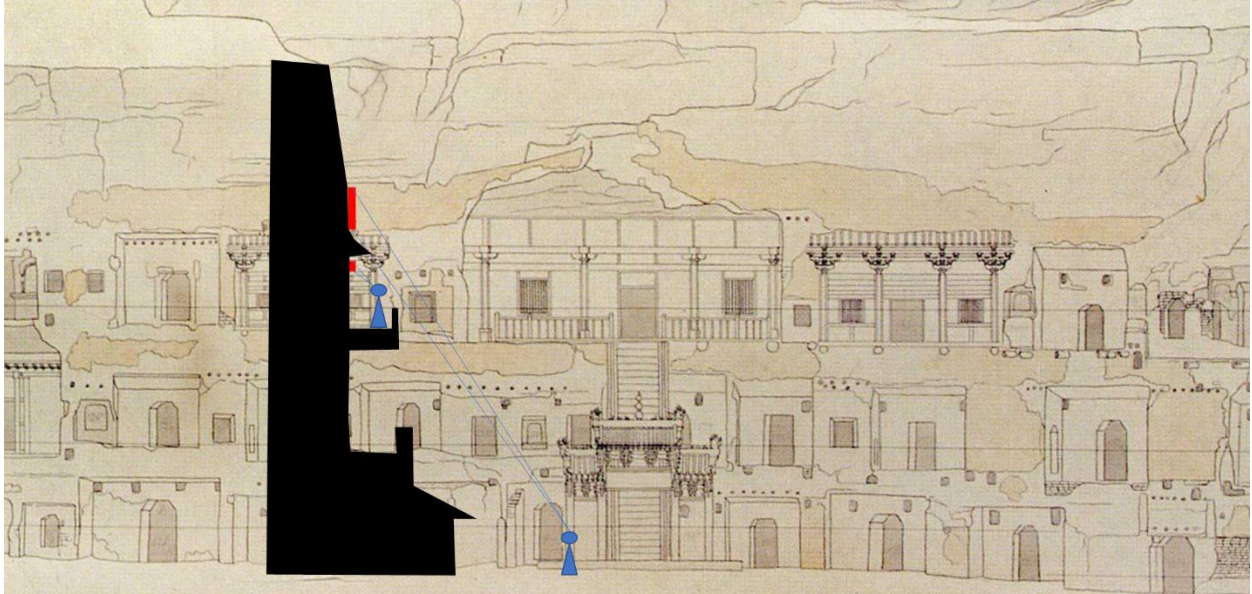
A diagram of the viewing angle design for the open-air mural and painting on the façade of Cave 431. Drawing by author.
